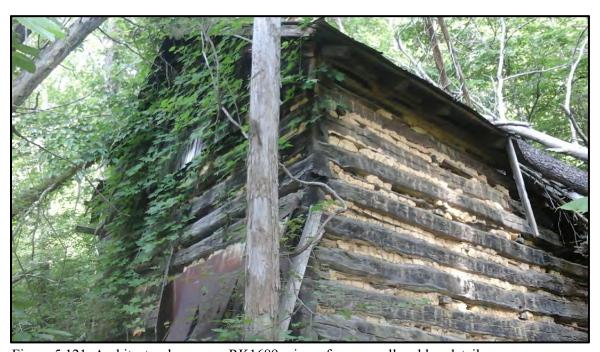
Architectural resource RK1689; view of upper wall and log detail.
